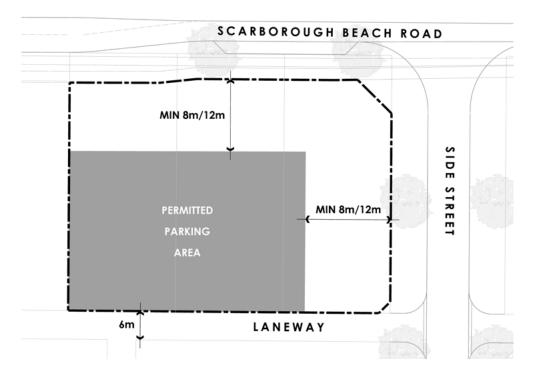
PERMITTED PARKING AREAS TO GROUND AND UPPER FLOORS
